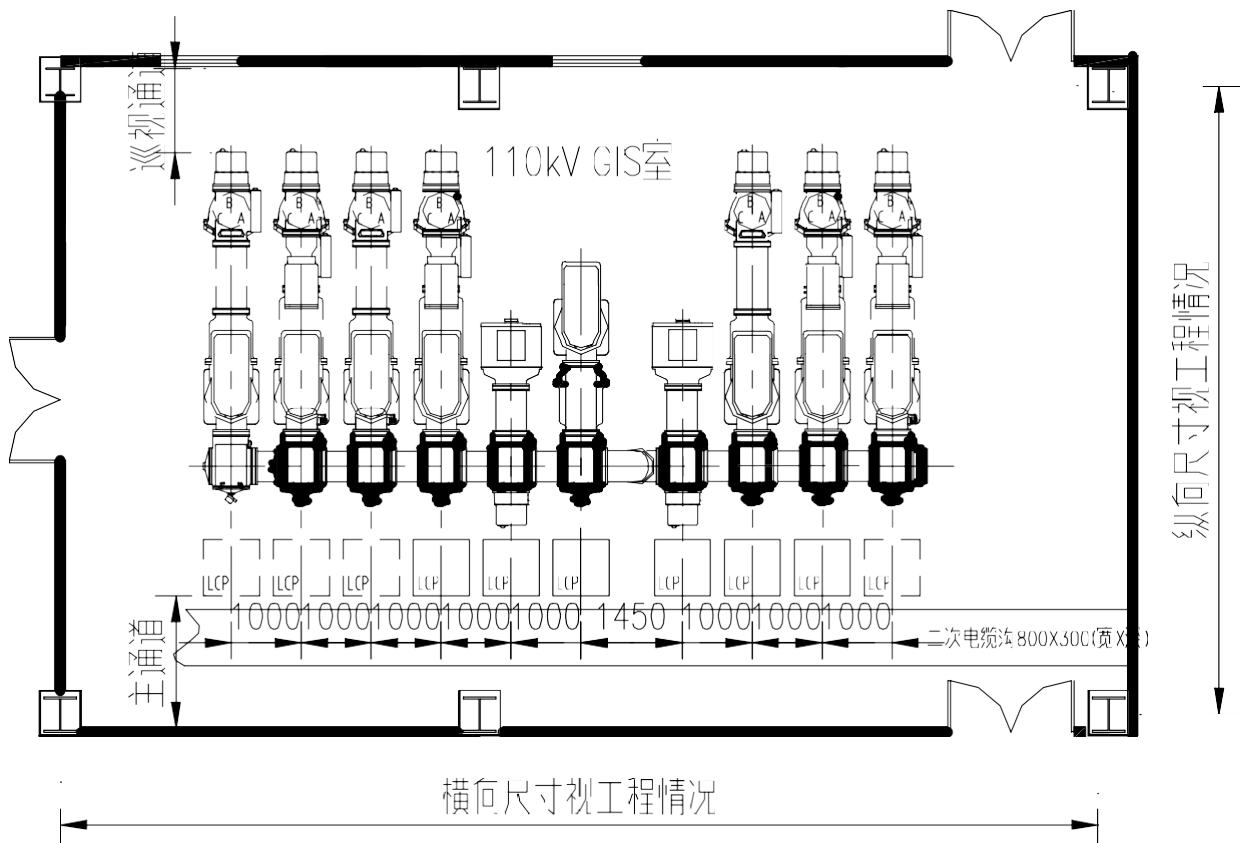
Schematic layout of 145kV indoor GIS scheme (for single busbar connection, internal bridge connection) (1GIS-2000/40)
